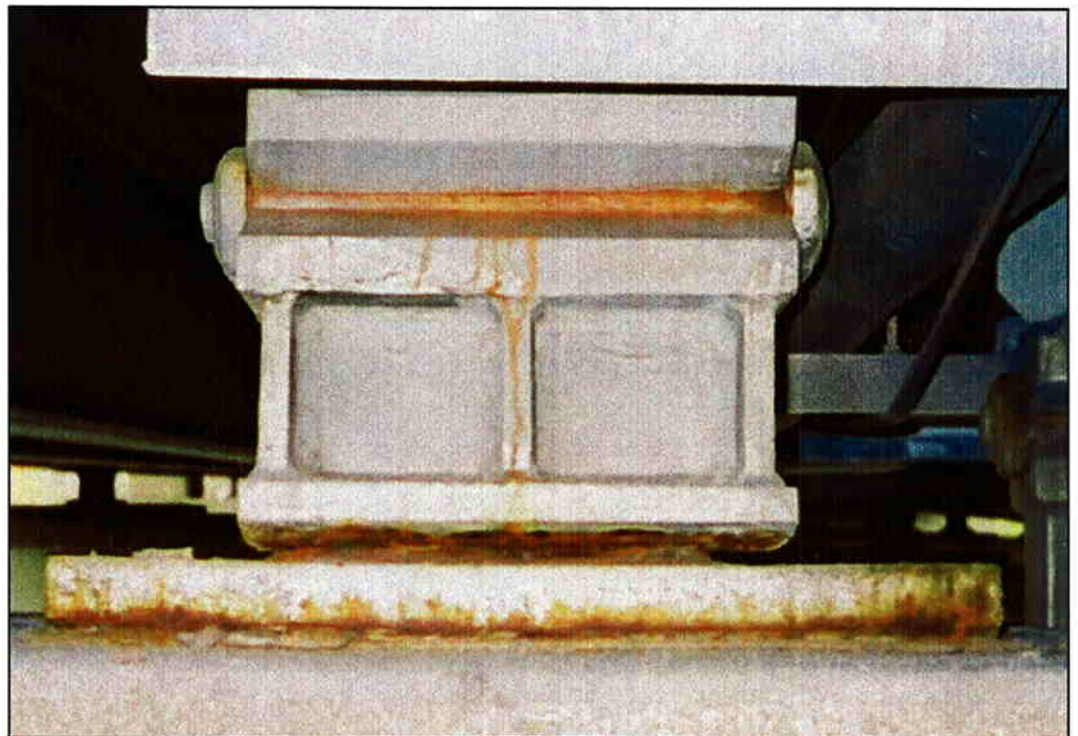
Looking north at bearing for girder 4, Pier 4, lower deck. Note pack rust has lifted rocker by 1/2 inch from masonry plate and fretting corrosion on pin.
